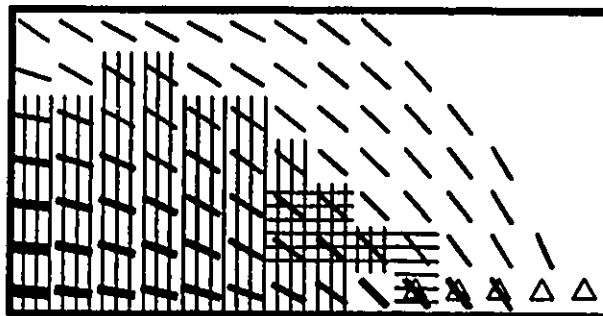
Wall 1 analytical crack patterns at 4 mm
